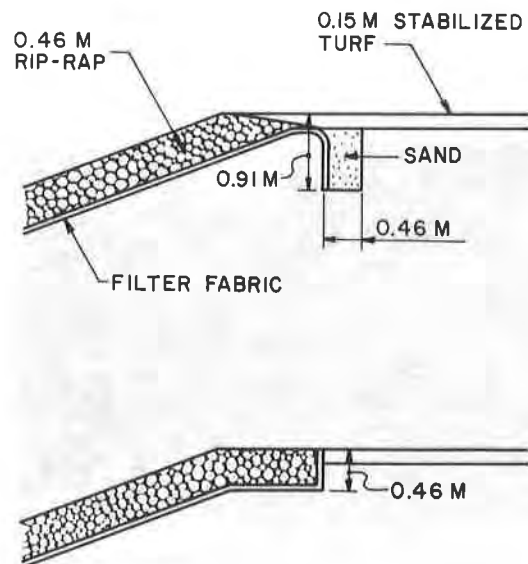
Filter Cloth Anchorage Details at Top of Slope
